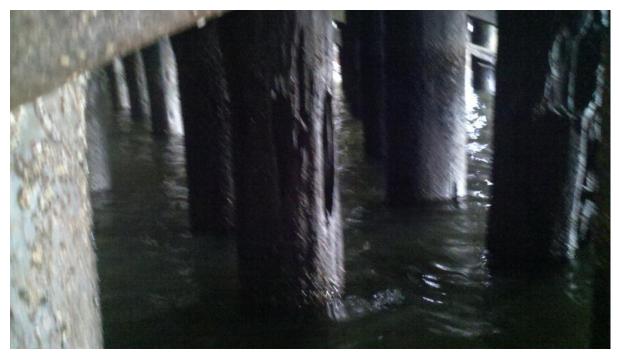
Waterside Pier South Platform: Typical pile condition showing moderate to advanced deterioration in upper 6' to 8'.
